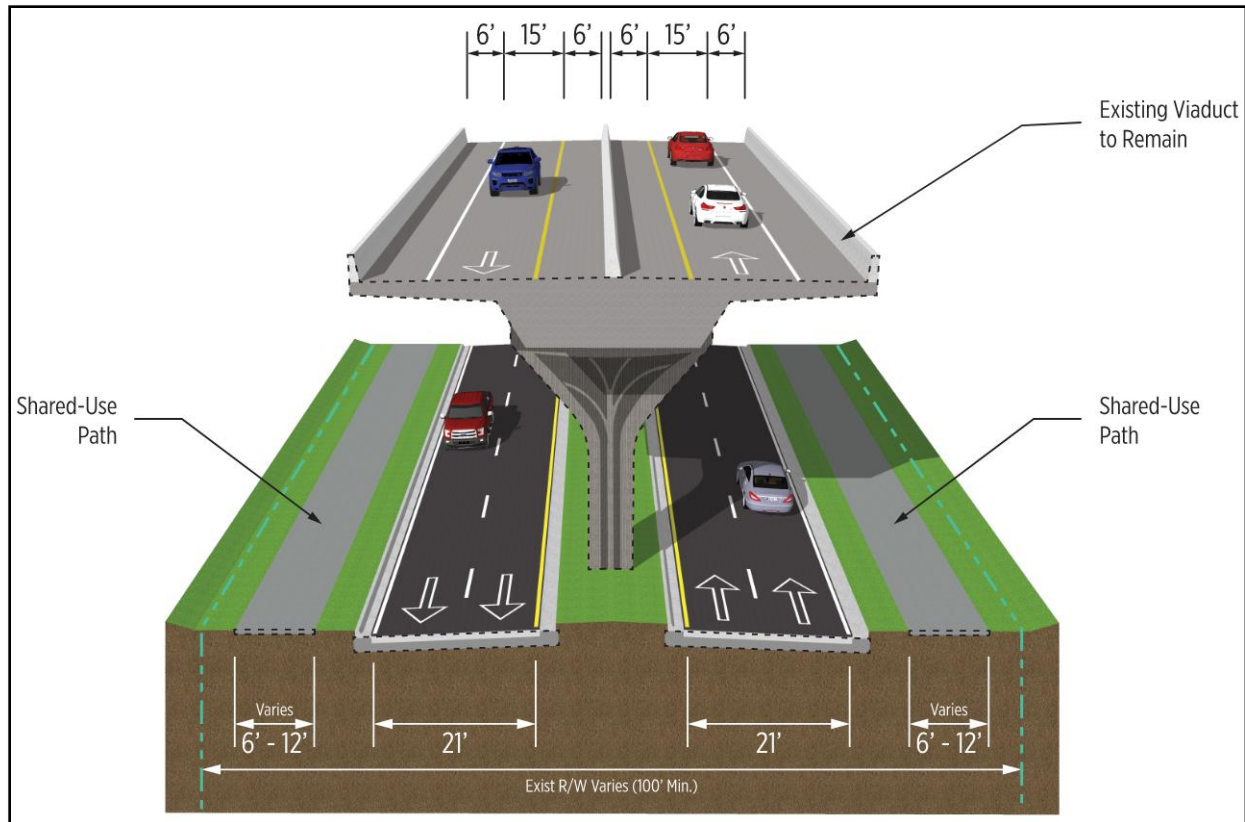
Hillsborough Segment – from 1,800 feet west of Bridge Street to West Shore Blvd.
